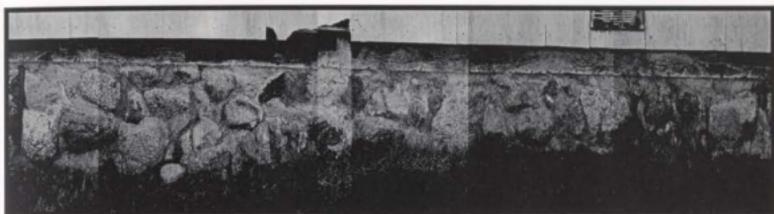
Board-formed concrete foundation, as seen on the 1948 addition to the eastern elevation.
